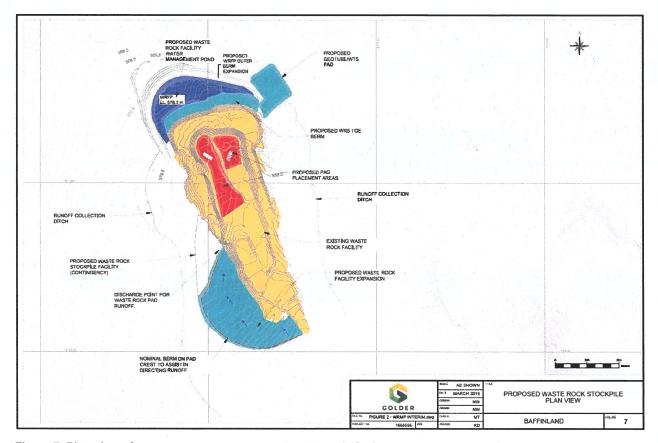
Plan view of permanent water management upgrade (to be constructed in 2018).
